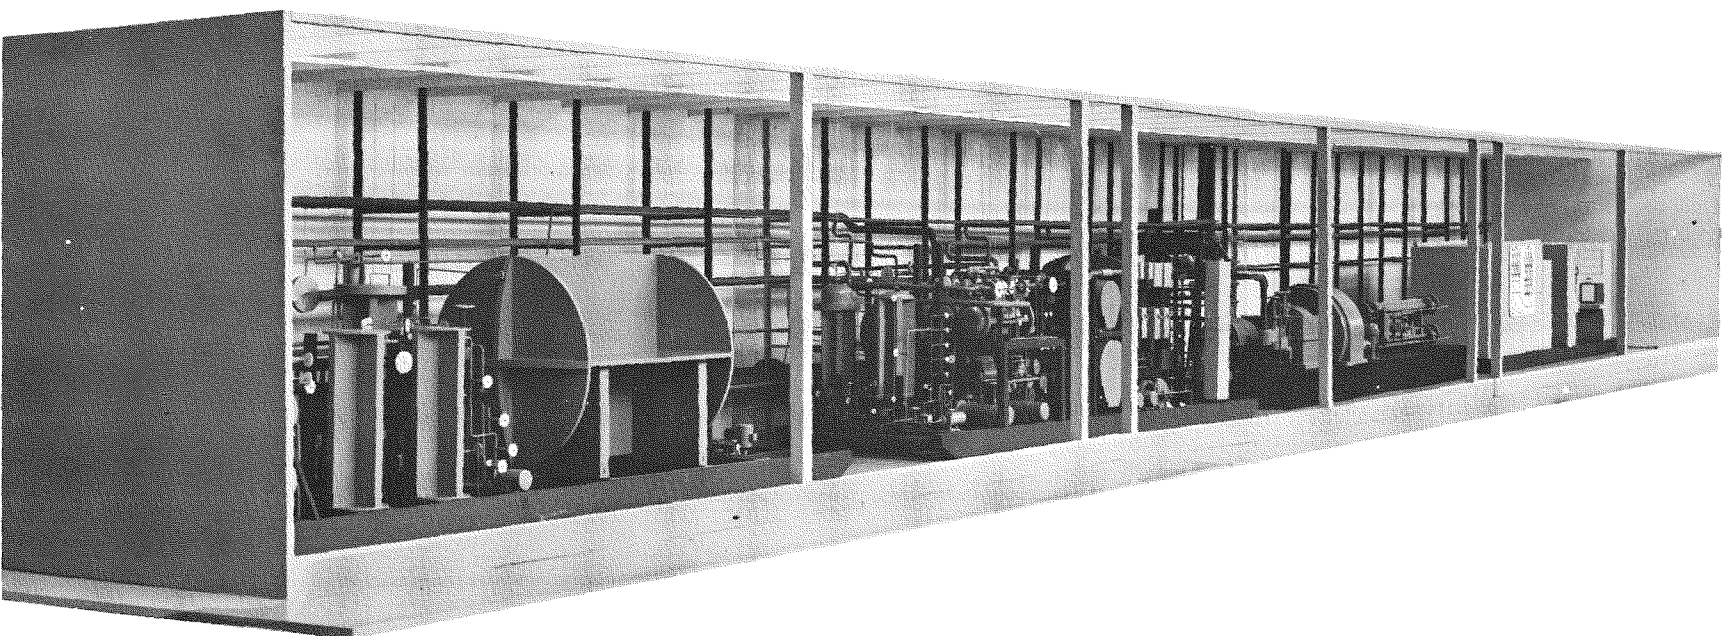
POWER PLANT BUILDING ARRANGEMENT
